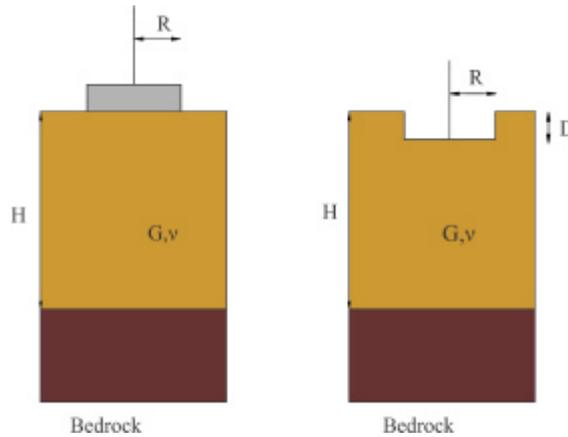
a. Circular footing on stratum over bedrock, b. circular footing embedded in stratum over bedrock
